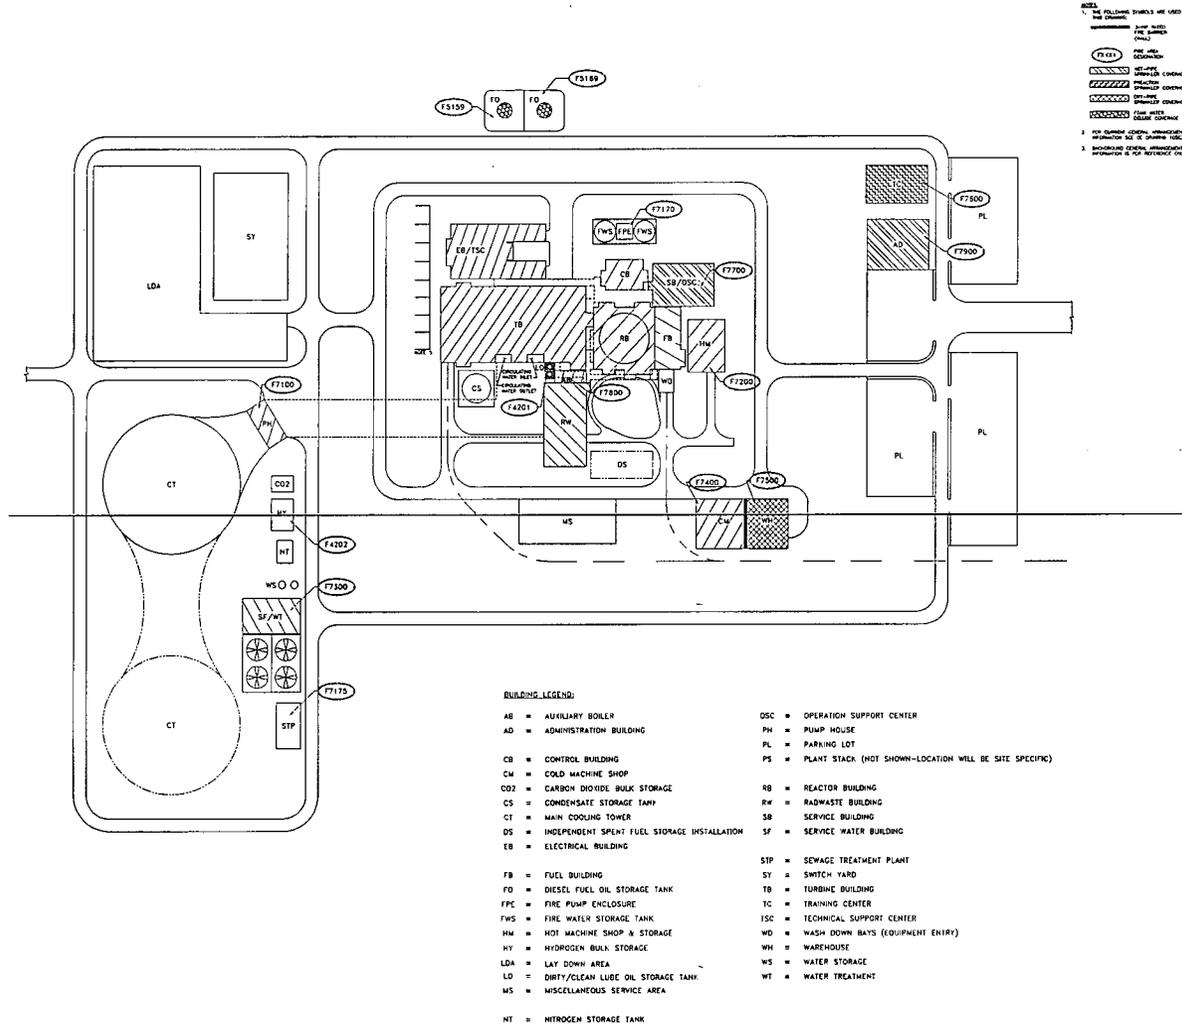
A.2-33. Site Fire Protection Zone ESBWR DCD Plot Plan
